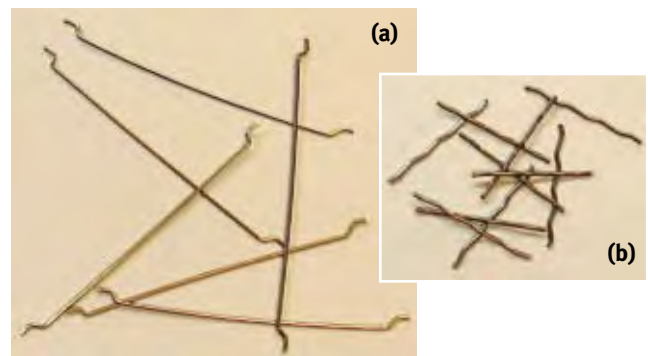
Typical deformed steel fibers: (a) hooked fibers; and (b) crimped fibers
